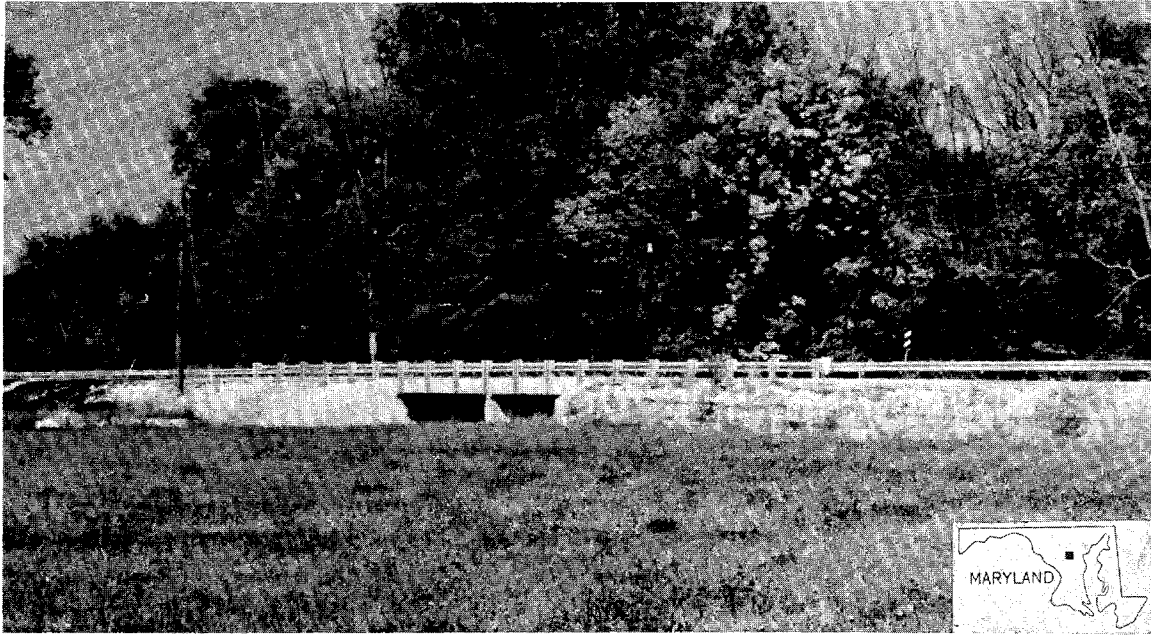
View of downstream side of approach embankment designed as an overflow structure. Note gabions along embankment for protection against scour when flows overtop roadway.
